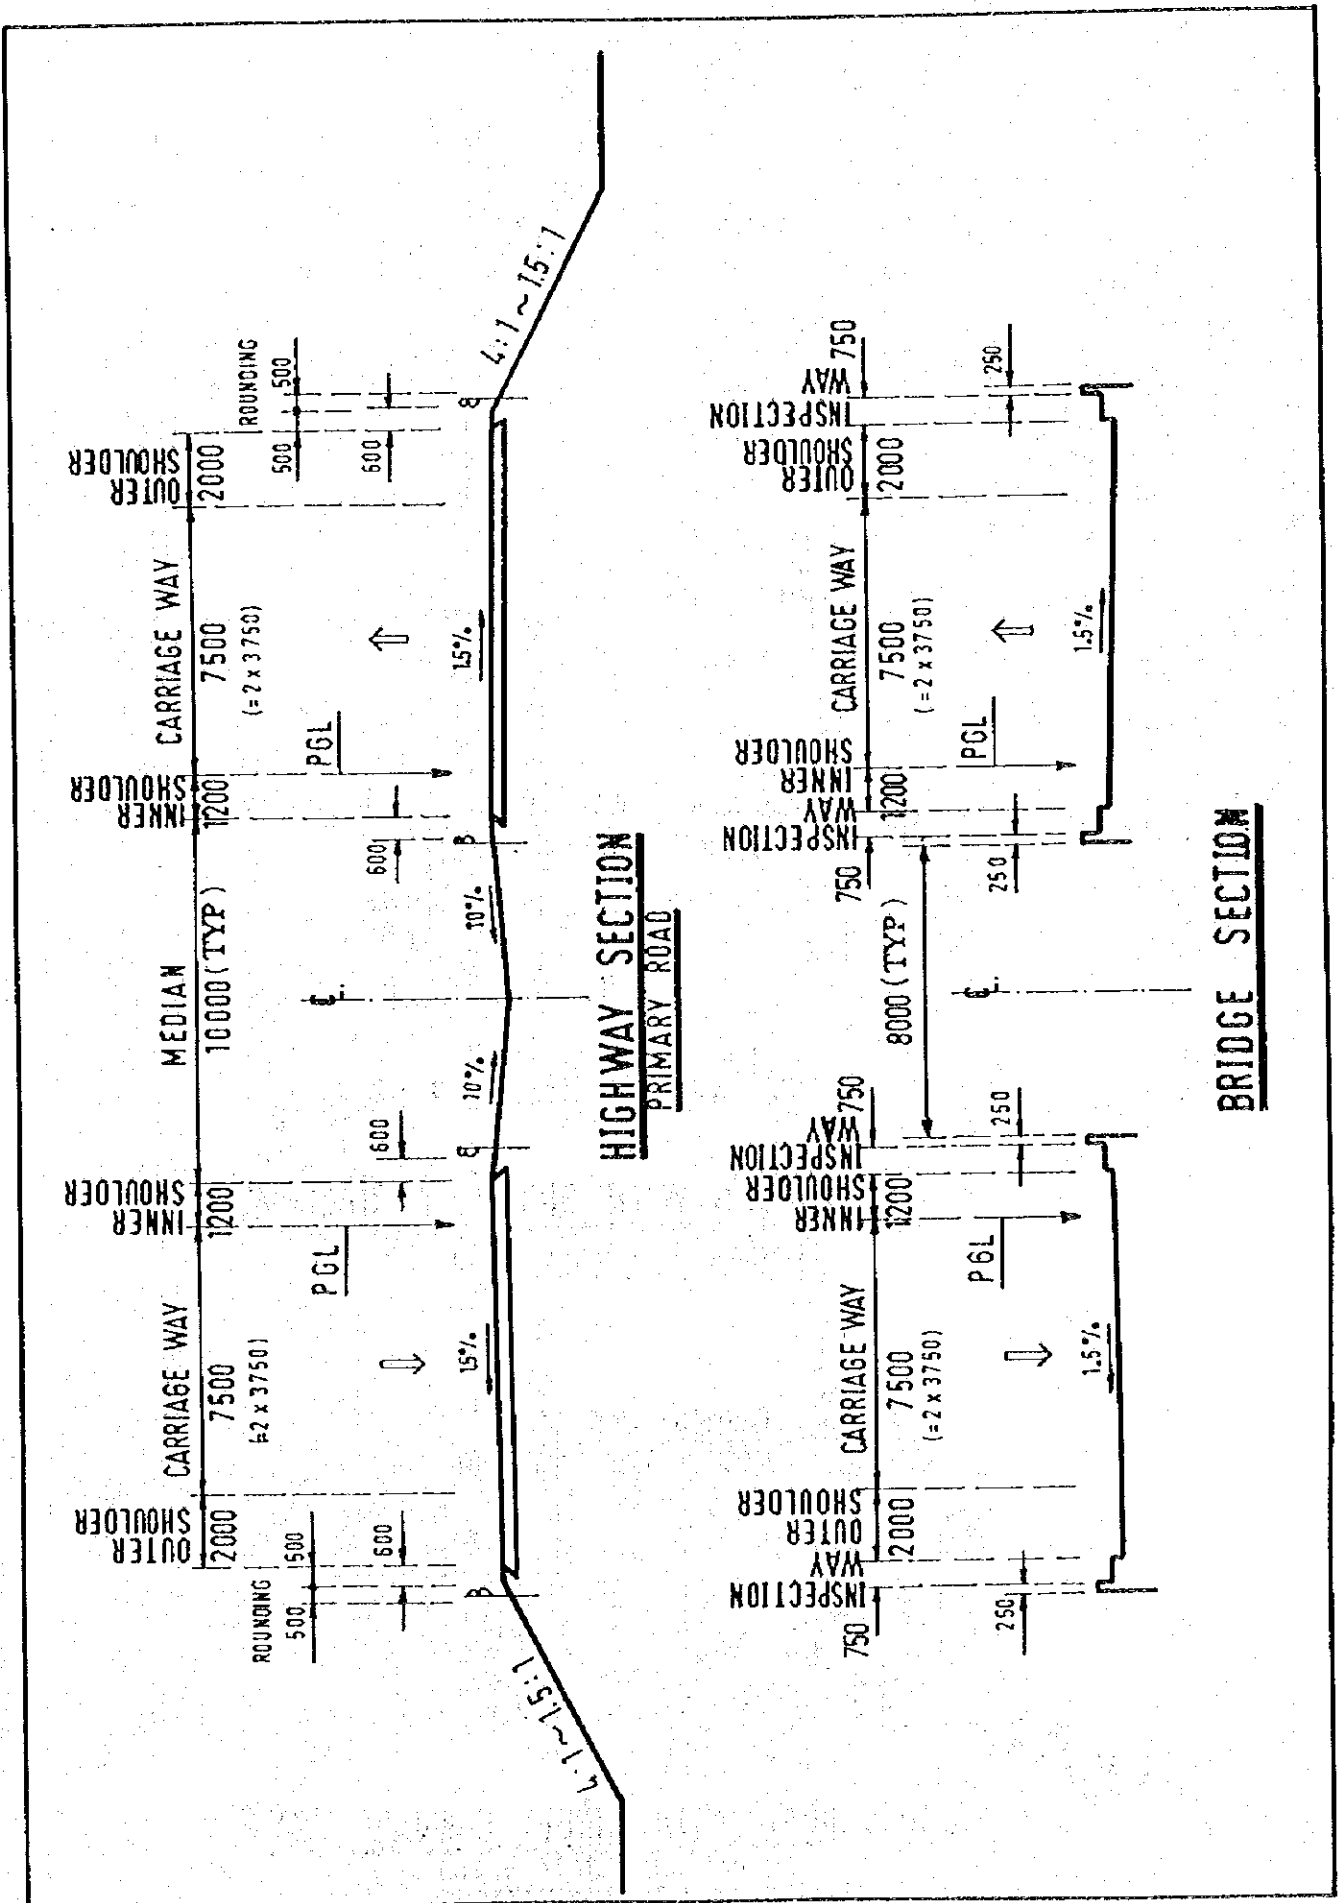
Typical Cross-Sectional Details of Proposed Highway and Bridge
